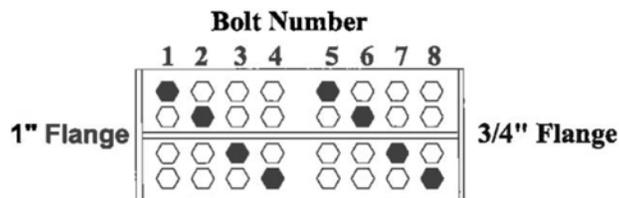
MRE 1/2-4W (Sumner and Murray 2001)
